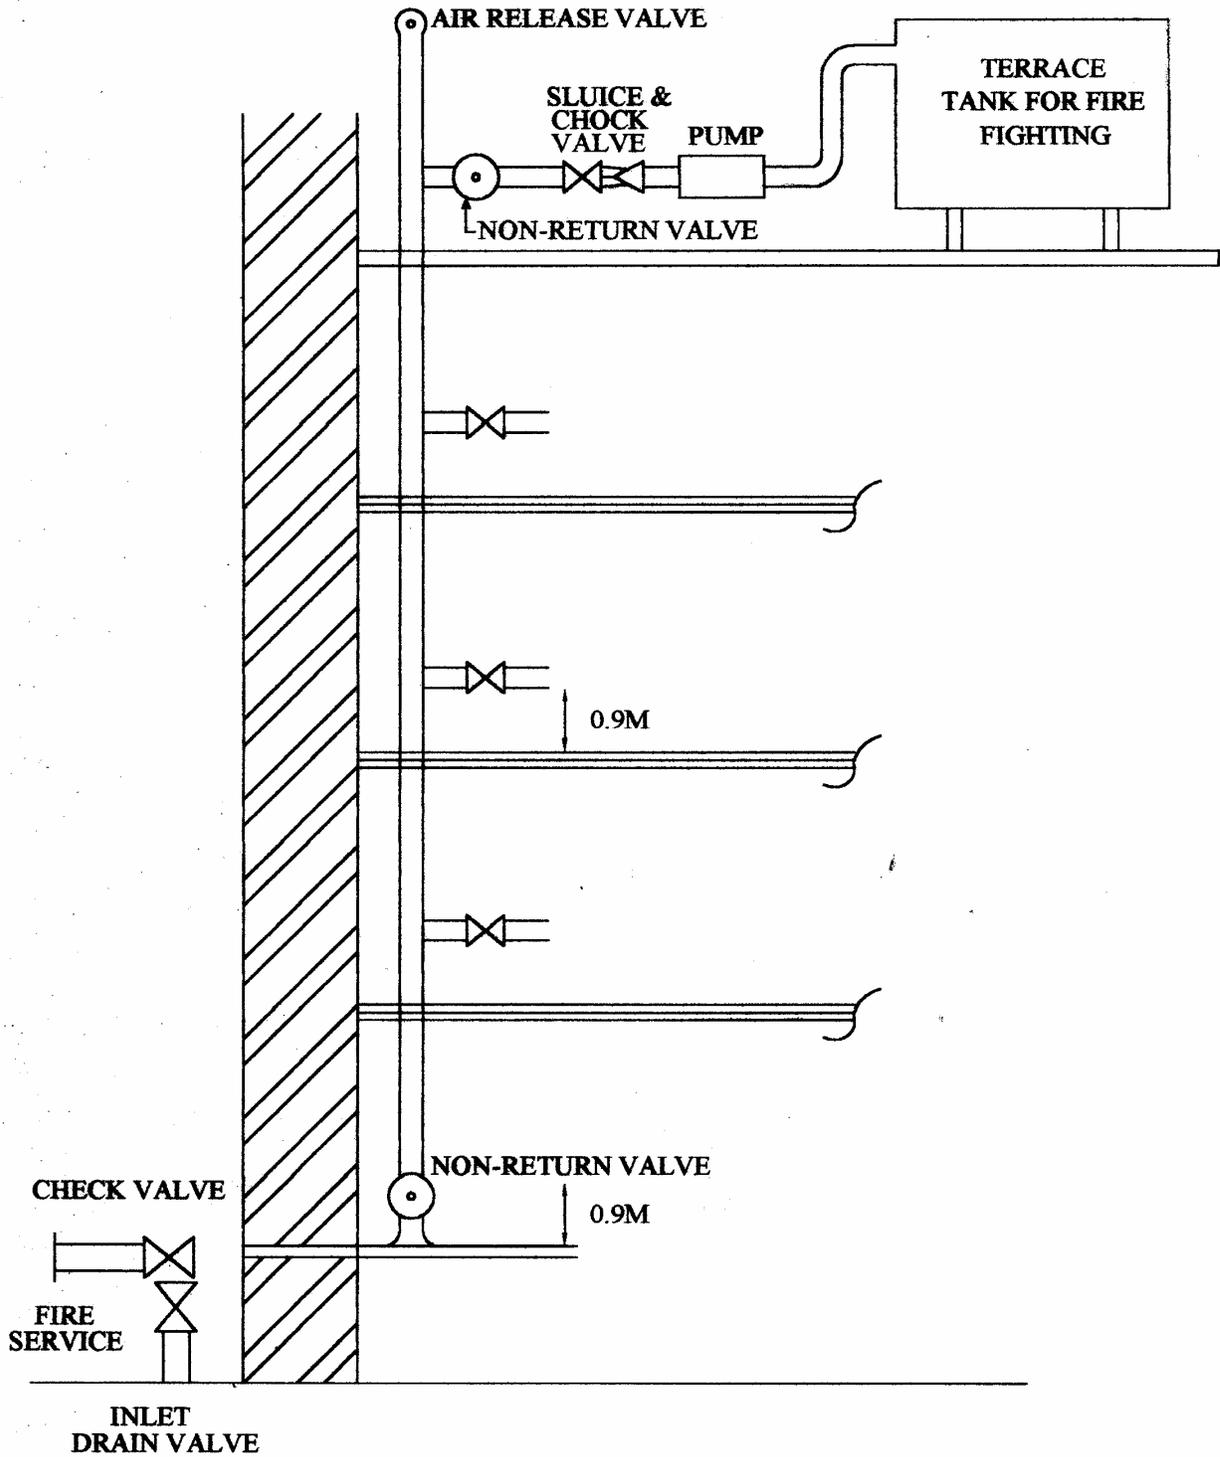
APARTEMENT BUILDINGS EXCEEDING 16M
